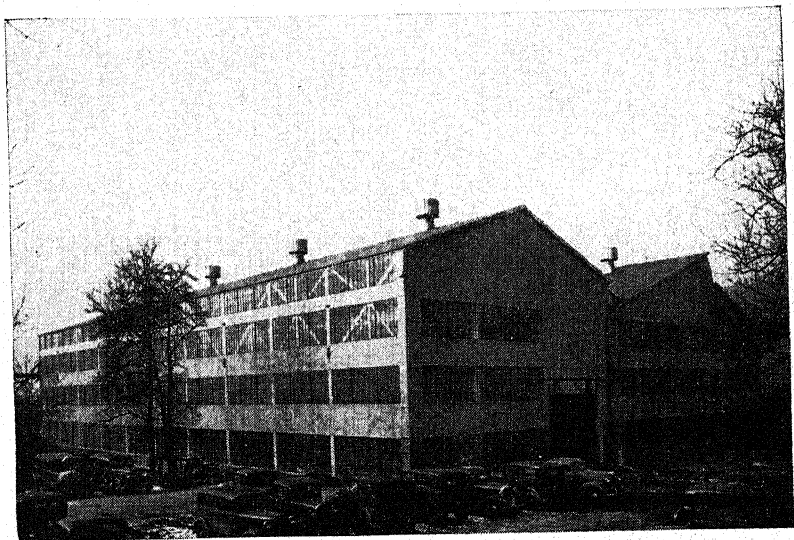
Barge assembly plant of arc welded construction.
